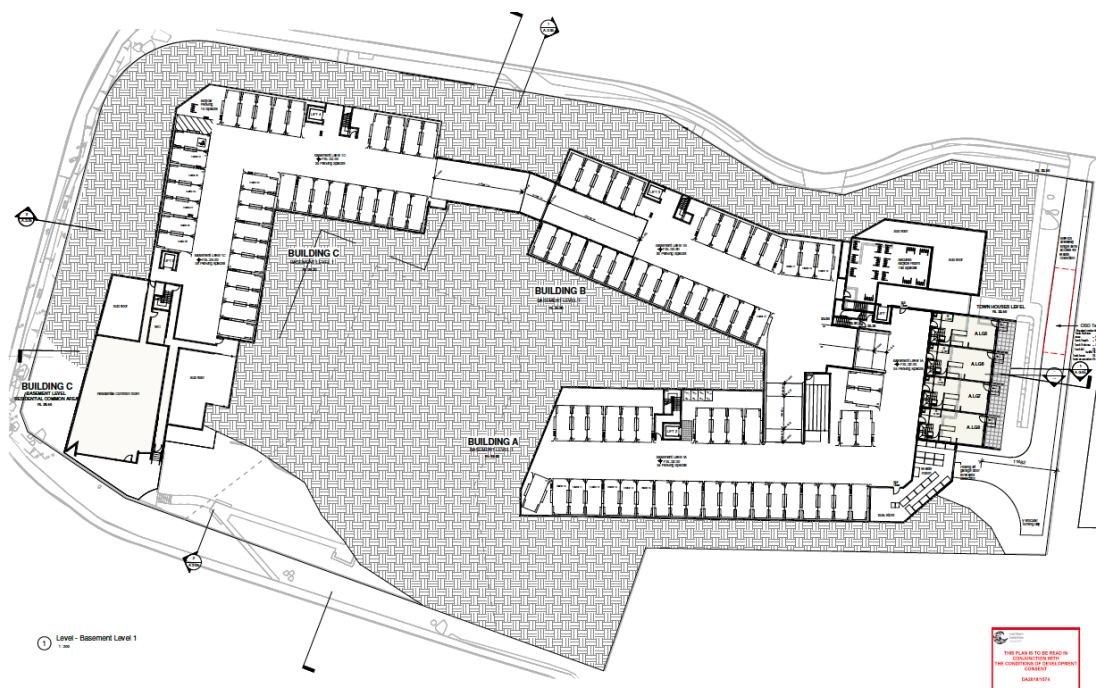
Approved Basement Parking Plan 1 (extract from DA/2018/1574 A2.02/C)
